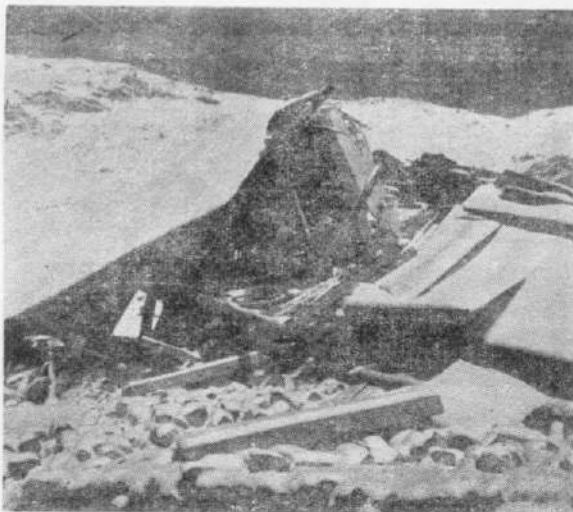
Total collapse of Post and Telegraph building at Leo village.
